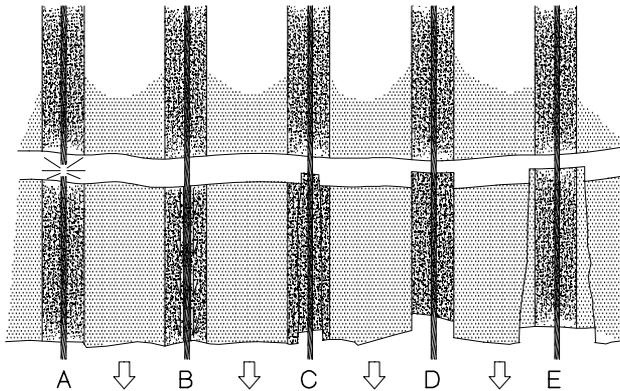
Possible cablebolt failure modes (after Jeremic and Delaire, 1983)
